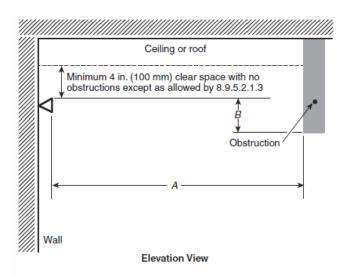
Positioning of Sprinkler to Avoid Obstruction (Extended Coverage Sidewall Spray Sprinklers).
